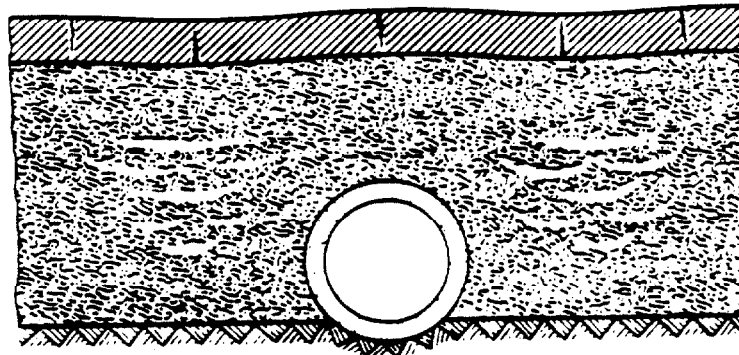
Pavement failure due to inadequate compaction of material quality adjacent to rigid pipe.<sup>(3)</sup>
